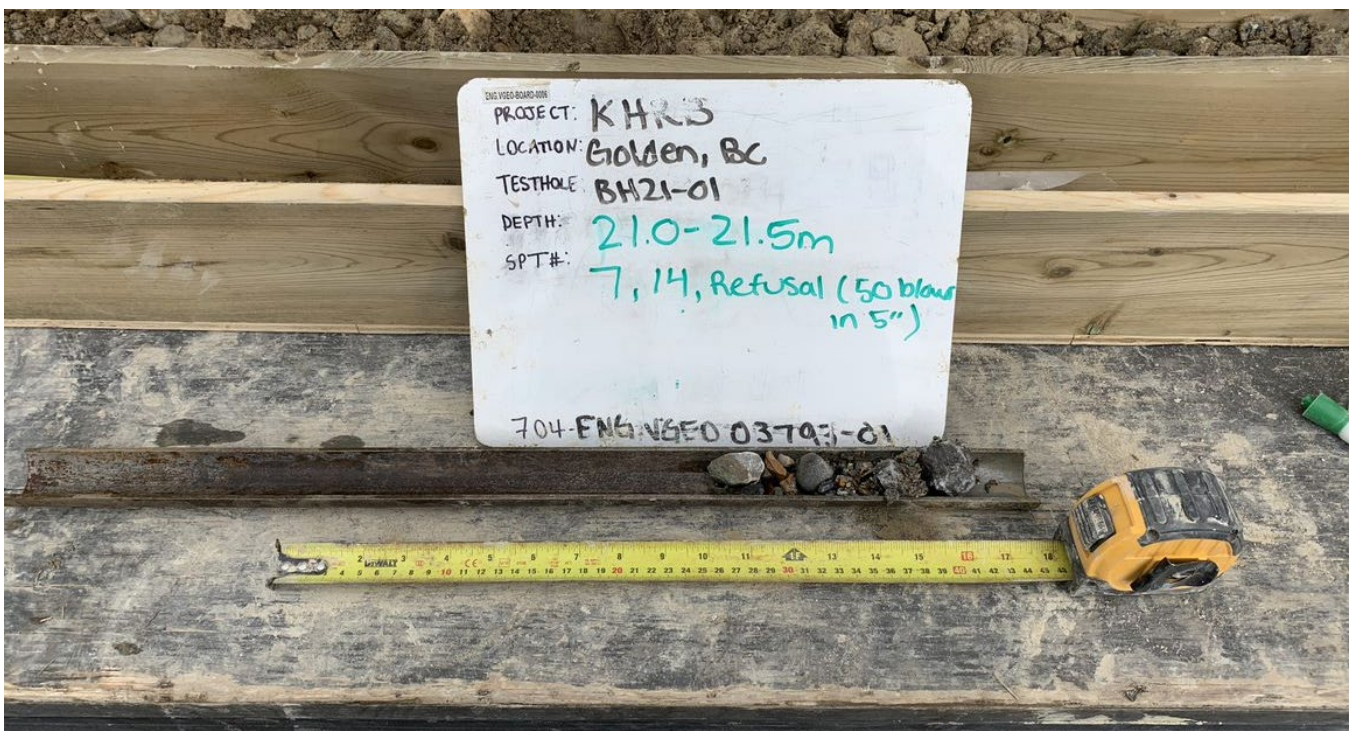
BH21-01, SPT-11, 21.0 m to 21.5 m
